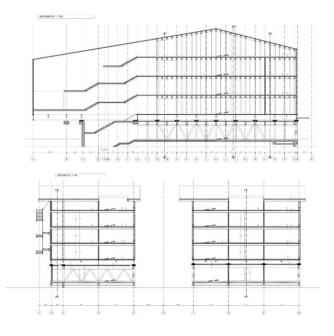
Longitudinal structural section of one of the two buildings (above) and transversal structural section of the two buildings (below).
